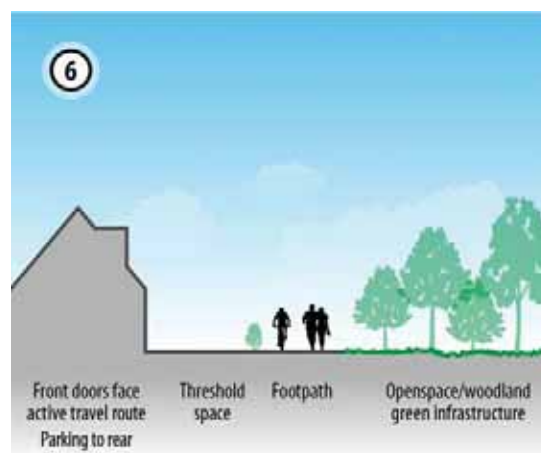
Indicative Street Section 6: Edge frontage overlooking active travel route/green infrastructure.
